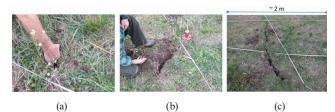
The exploration of cracks: a) Exploration of the crack detected by the Pre-P method and removal of vegetation; b) A partially explored crack; c) Part of the crack which has been excavated for longer distance
